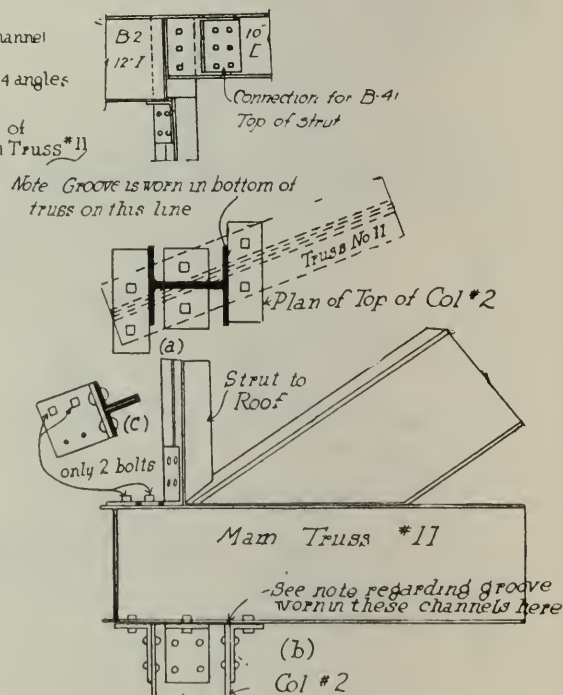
Plan and side view of Connection of Col*2 and Truss #11
